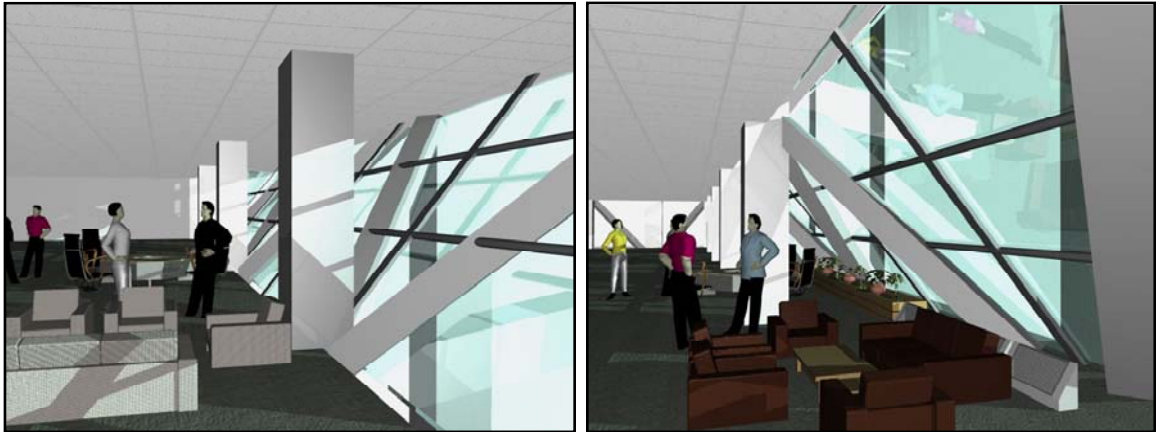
(a) The first interior space of the horizontal folded façade; (b) The second interior space has larger floor area
